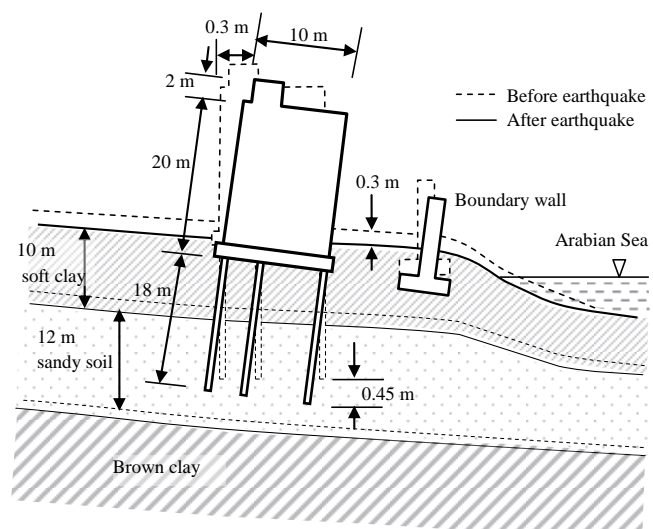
Schematic showing the tilting of the building assuming no structural failure in it.
